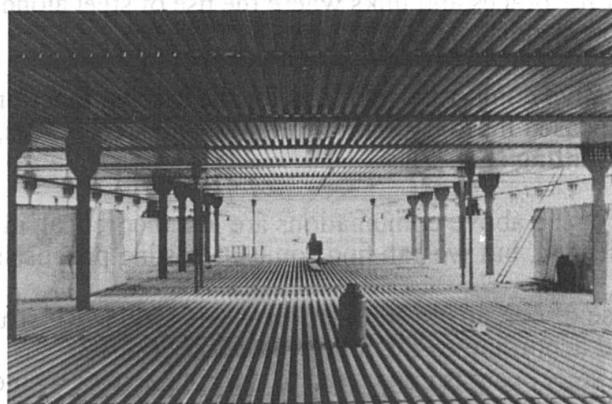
Steel trapezoidal sheetings before the concrete casting in a composite floor.
